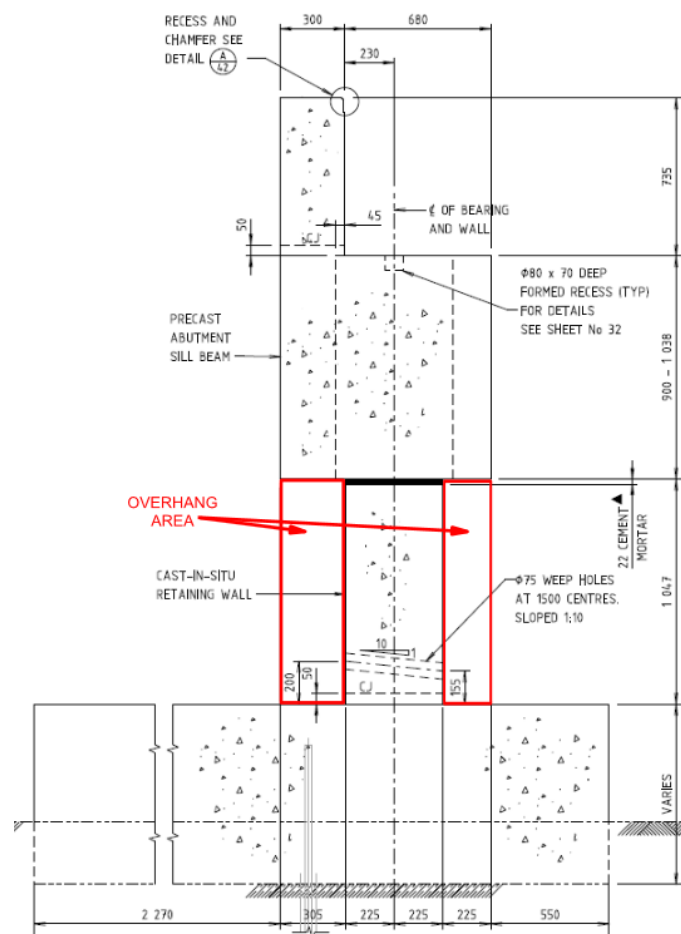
Inadequate depth of Abutment B retaining wall (RMS [annotated], 2016)
